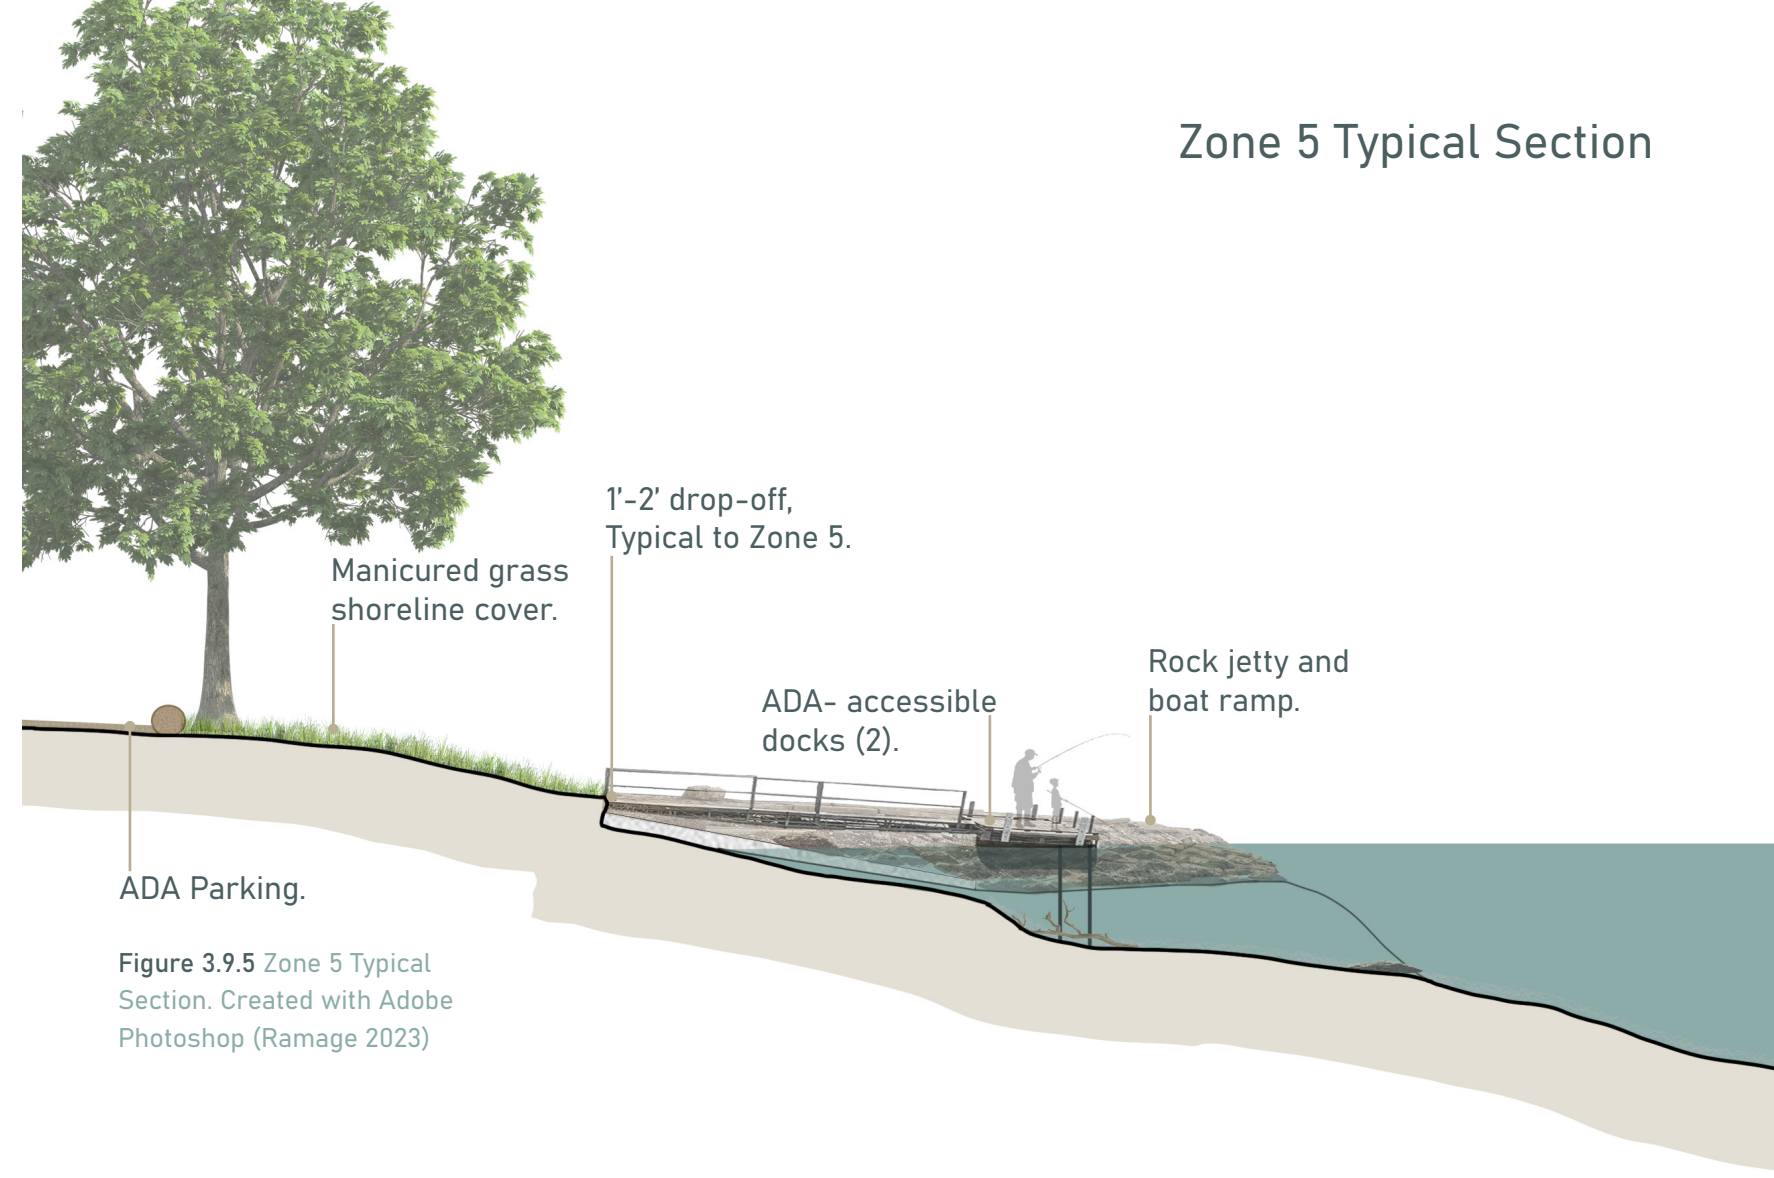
Zone 5 Typical Section. Created with Adobe Photoshop (Ramage 2023)
